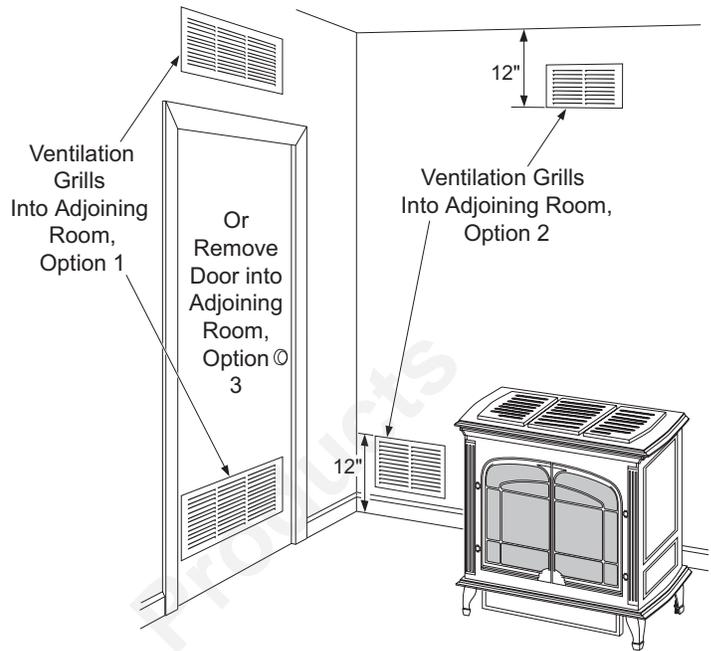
Ventilation Air from Inside Building (Stove Model Shown)
